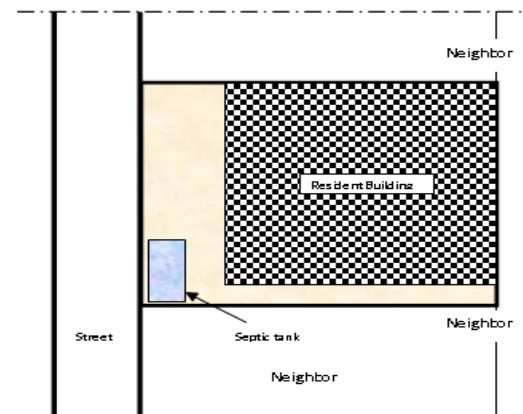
A Schematic Sectional Elevation for Obtaining Wastewater and Soil Samples
